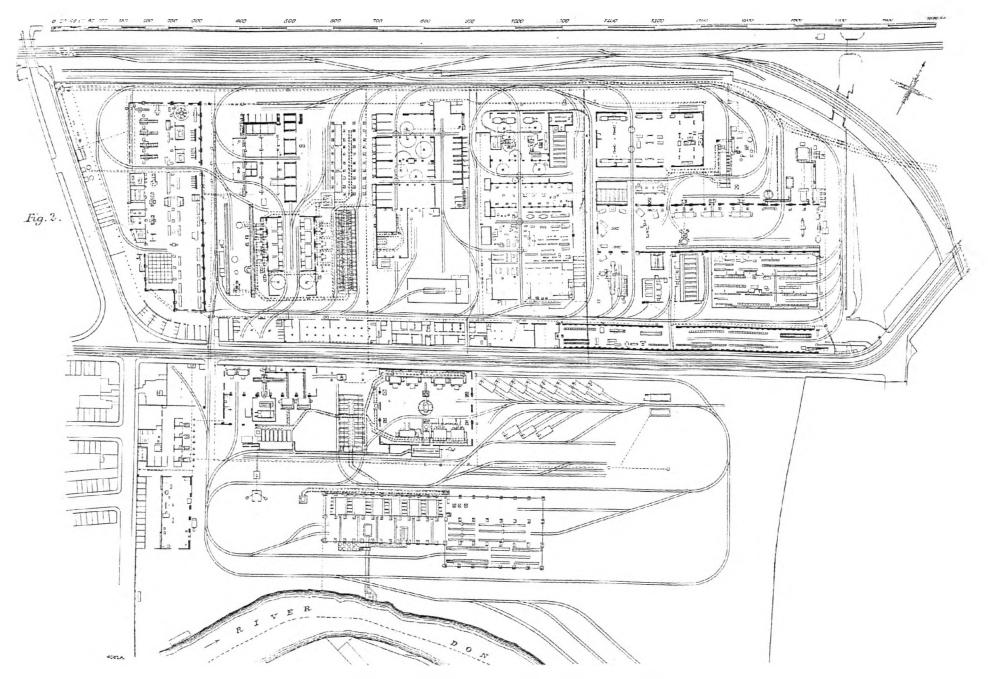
General arrangement plan of the River Don Works. Brightside. Scale 1:2500 (Engineering 1897).
